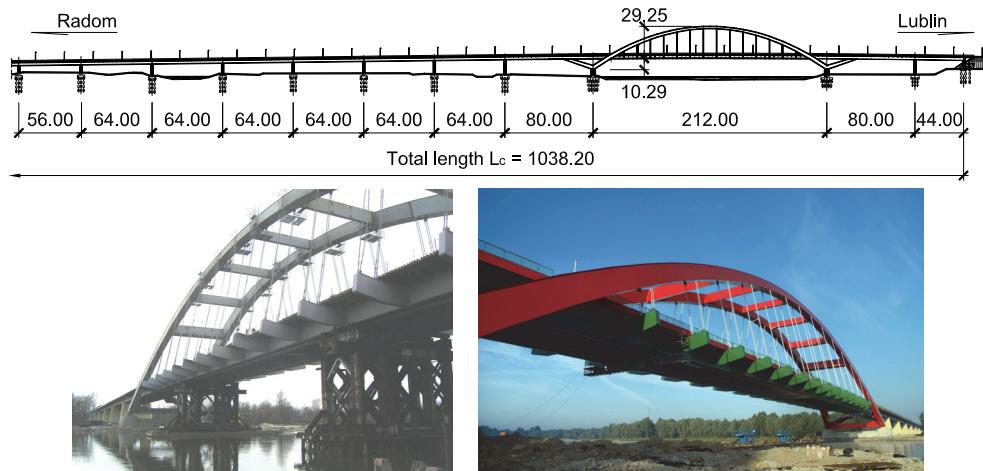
Bridge in Puławy: side view, view during construction and completed structure
